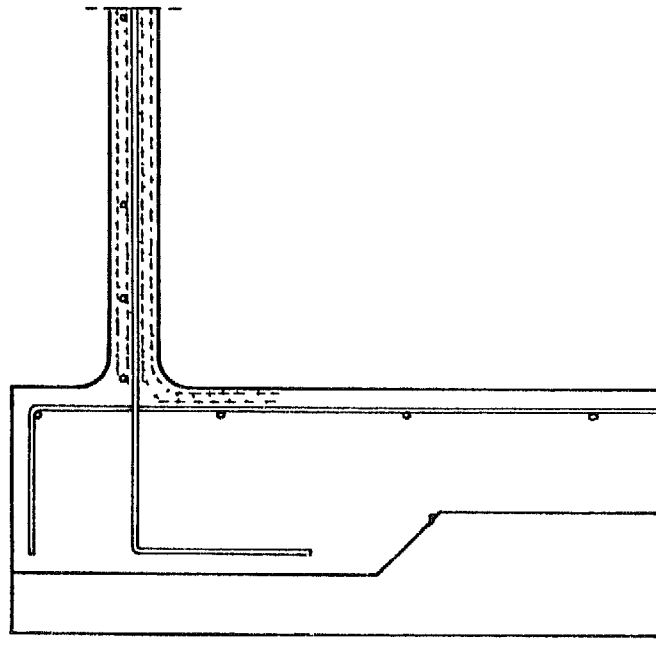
Wall-floor connection in ferrocement and reinforced concrete
